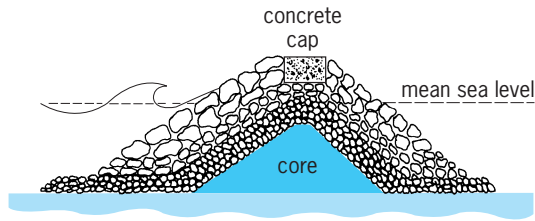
Cross section of a typical rubble mound breakwater placed on a sand foundation.
